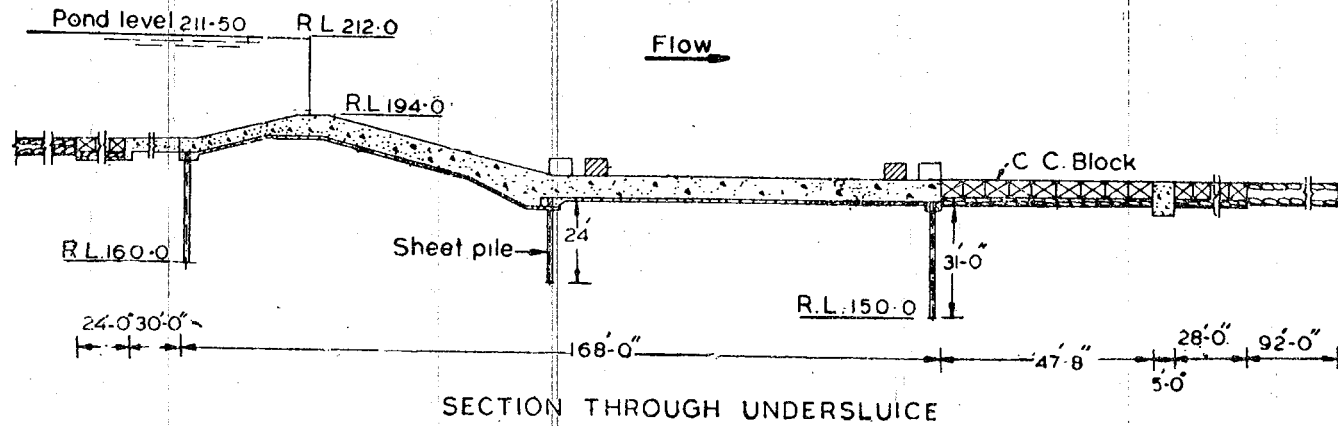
(b). Section through under-sluices of Durgapur Barrage.
